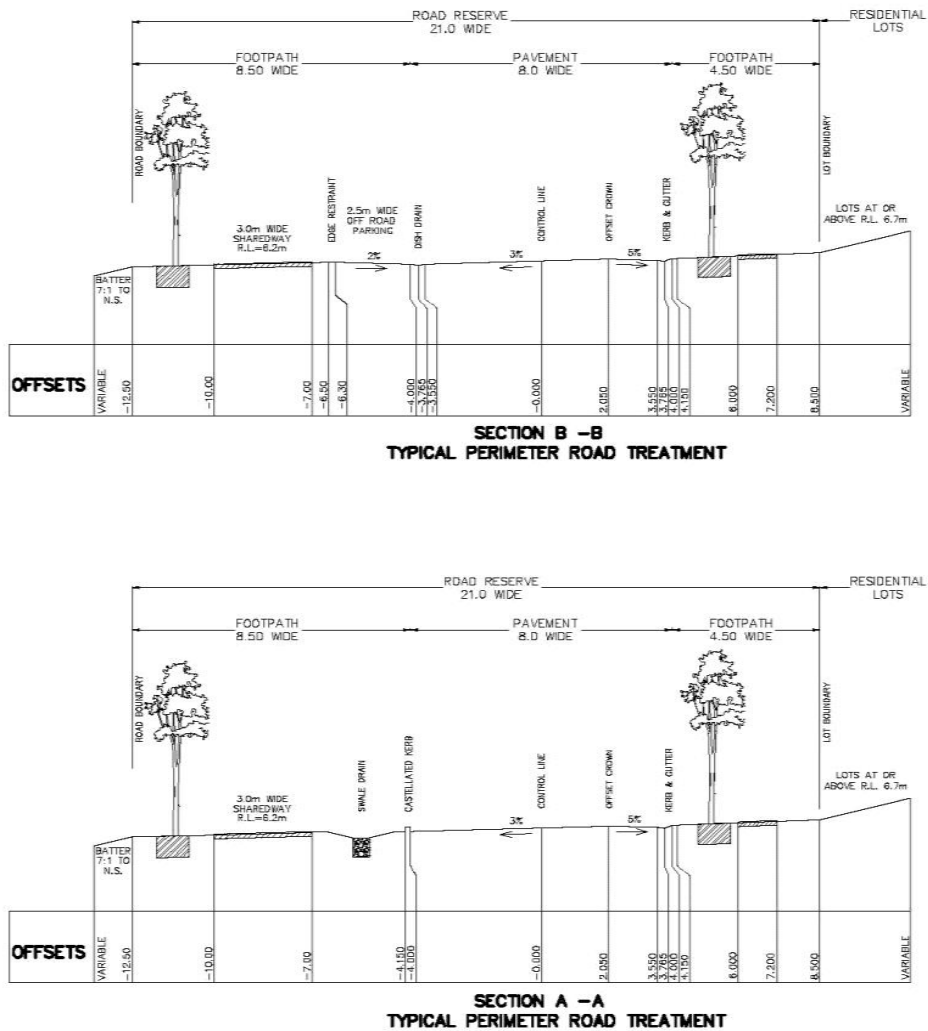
Chisholm West Precinct Plan - Raymond Terrace Road.
